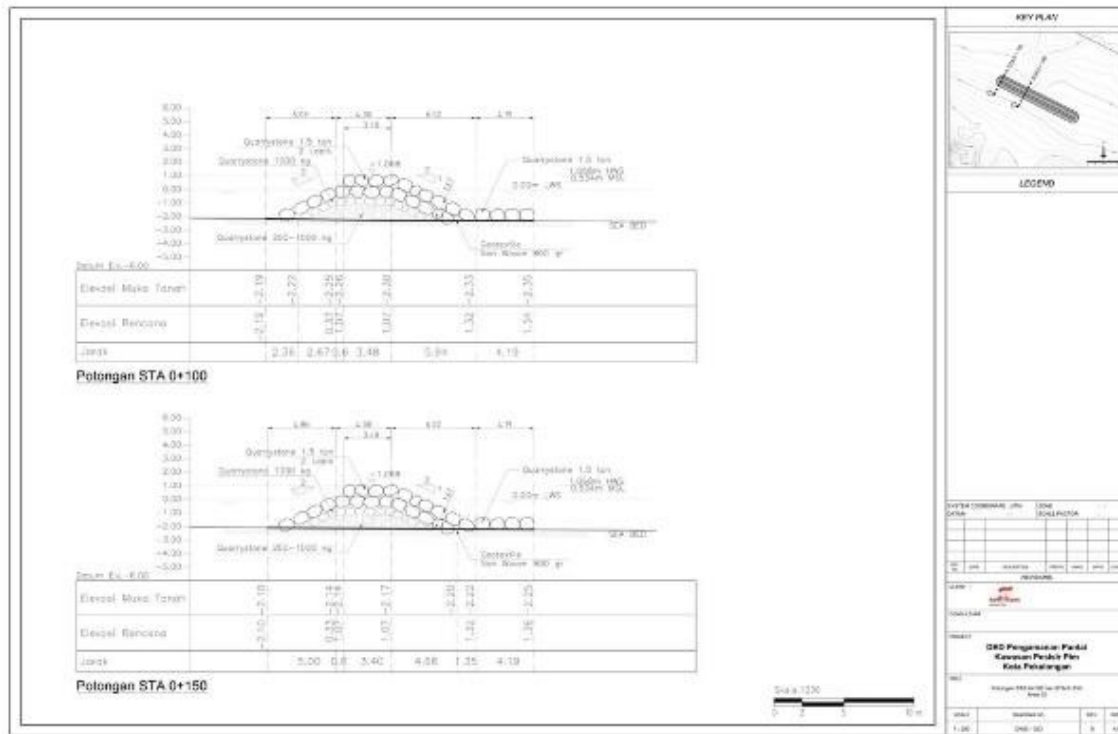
STA 0+100 Cross Section – STA 0+150 Area 2 Breakwater
